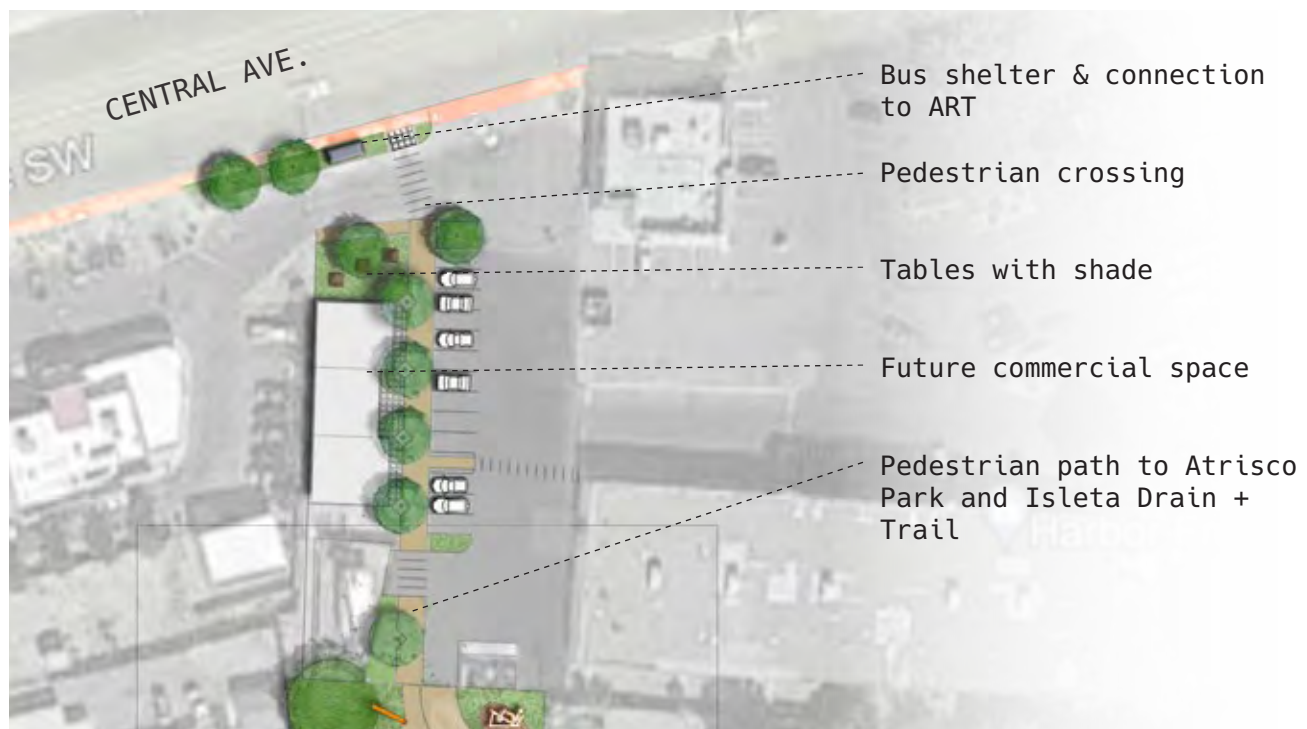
NORTH GATEWAY TRAILHEAD - CONNECTION TO CENTRAL AVE.
